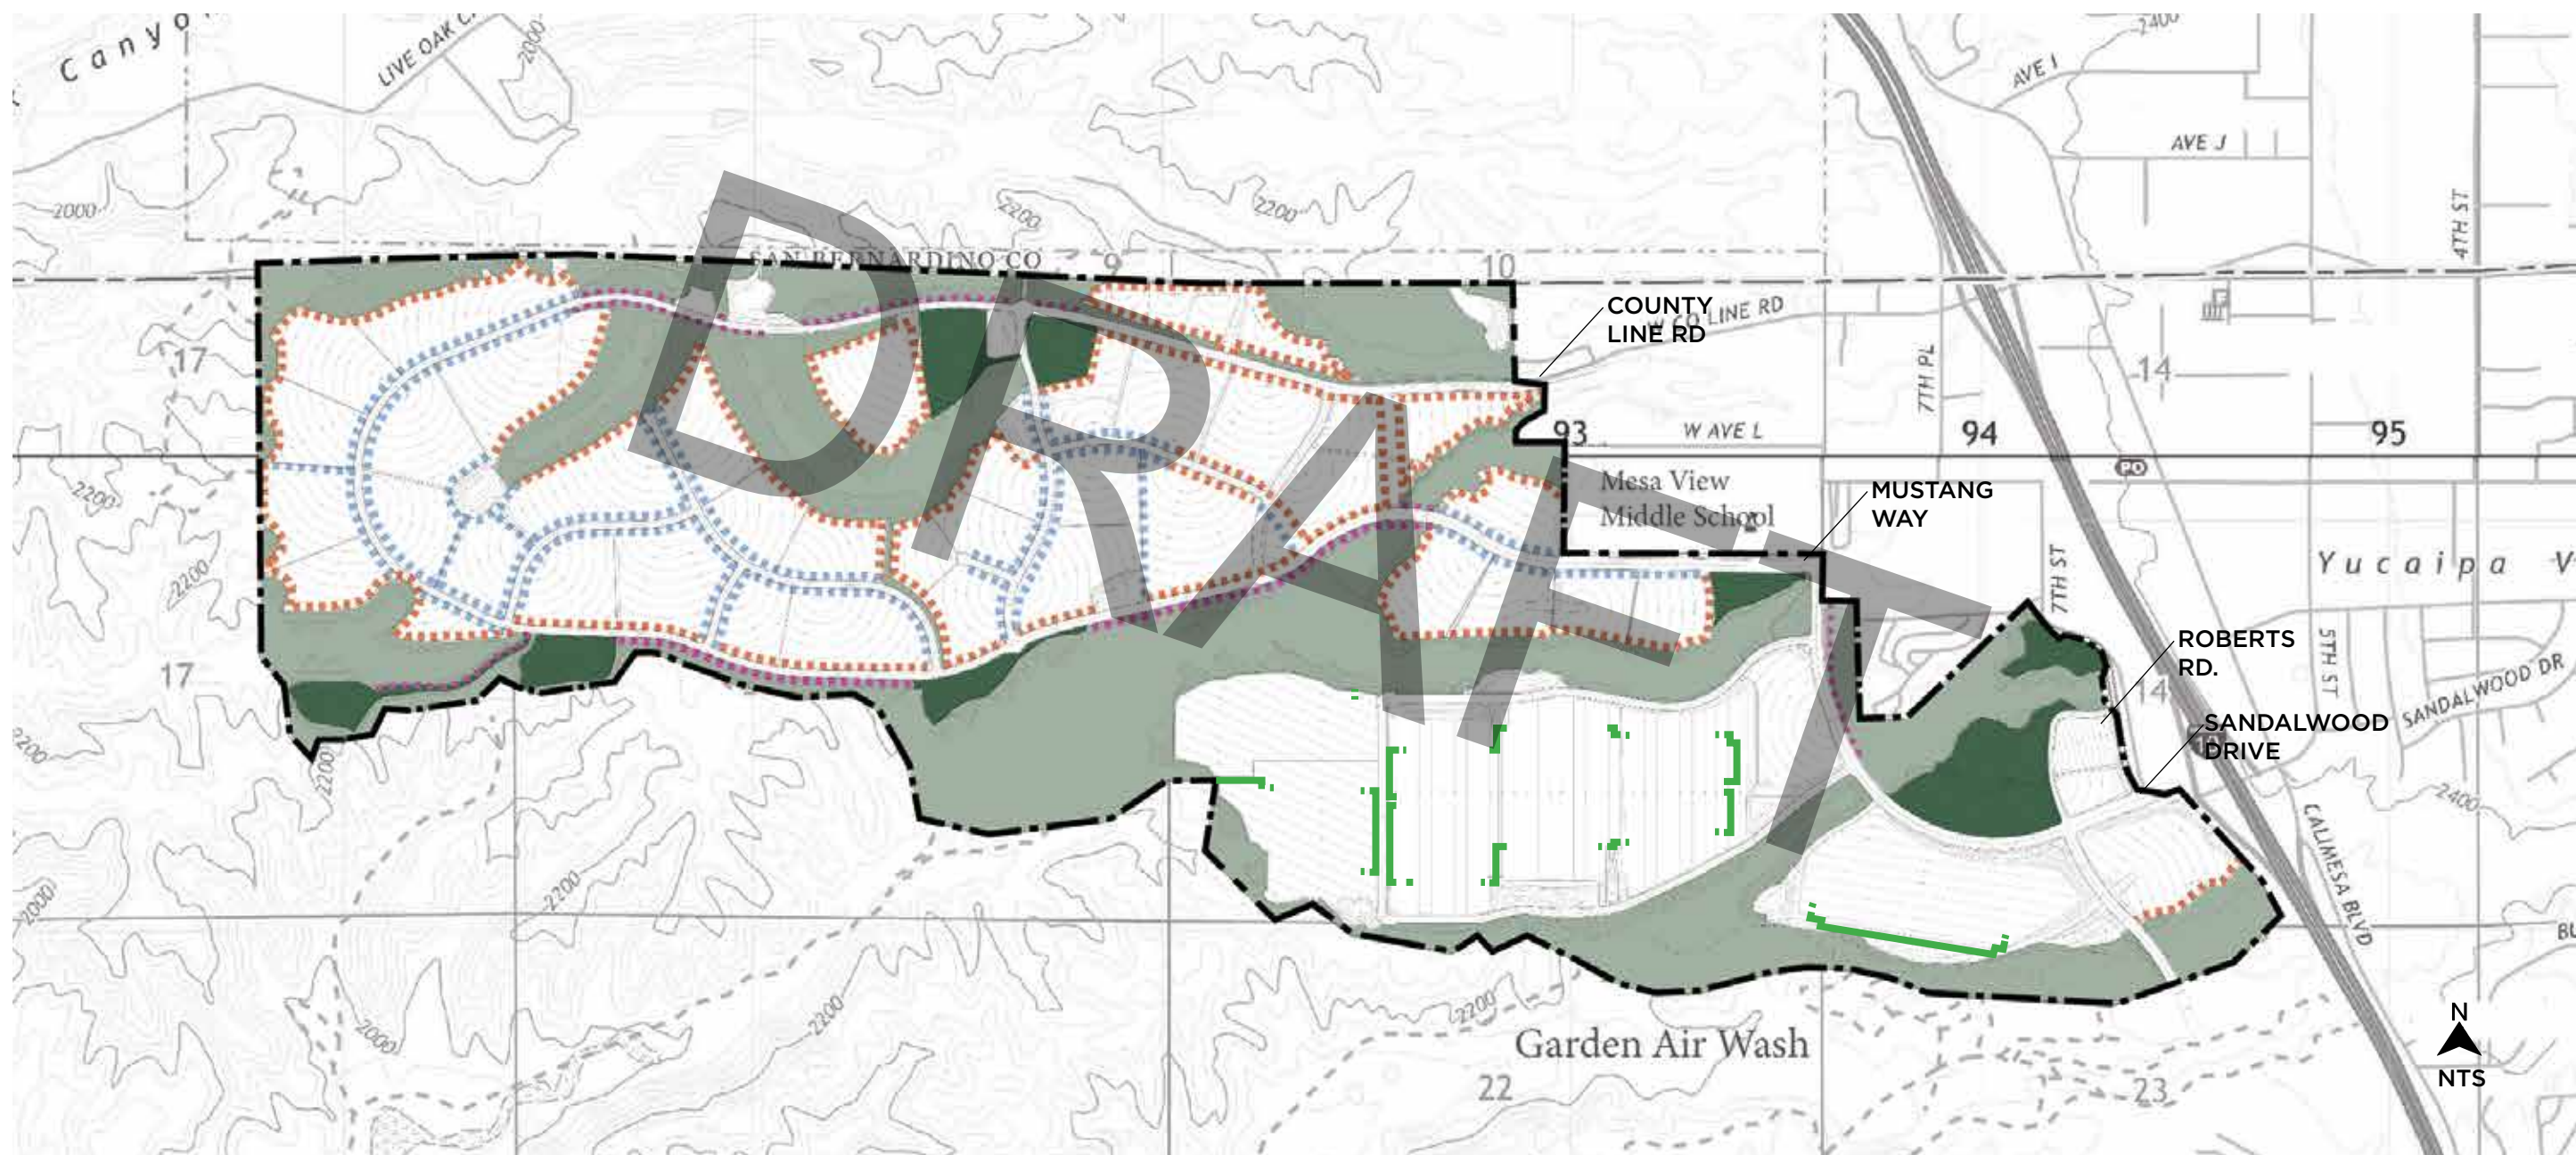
COMMUNITY WALL AND FENCE CONCEPT PLAN
